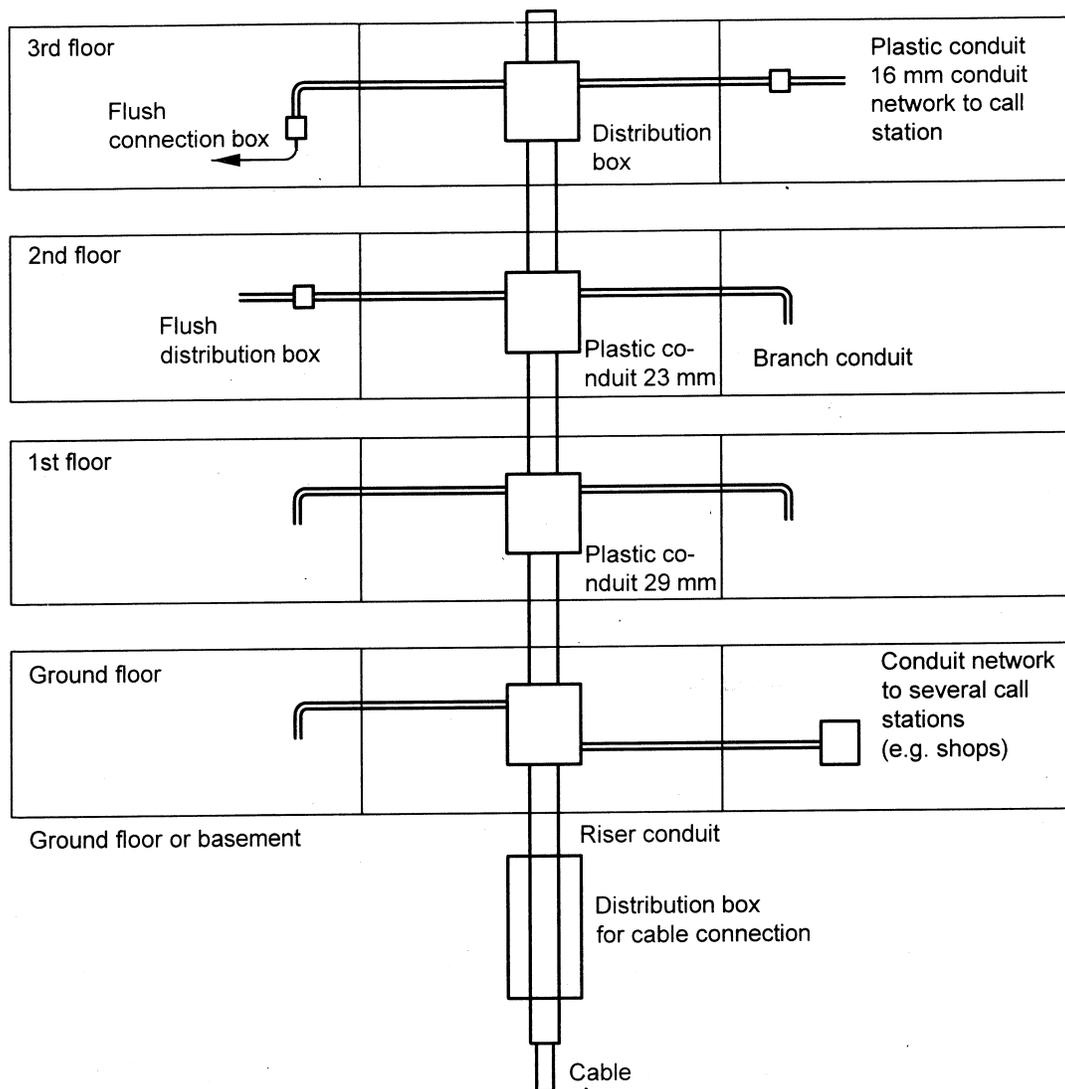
TYPICAL CONDUIT WIRING SYSTEM
